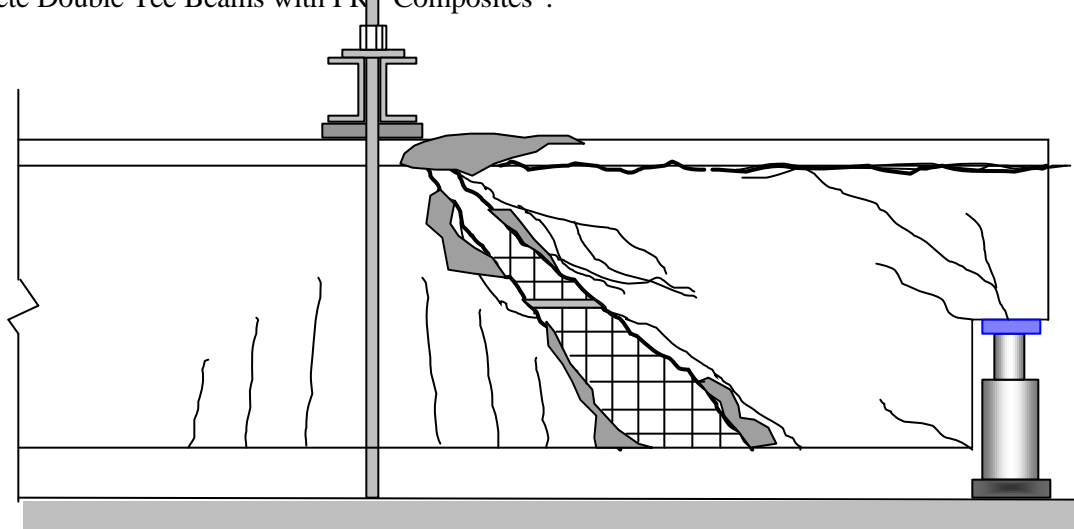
Appearance of Specimen 1S-8 after Failure
